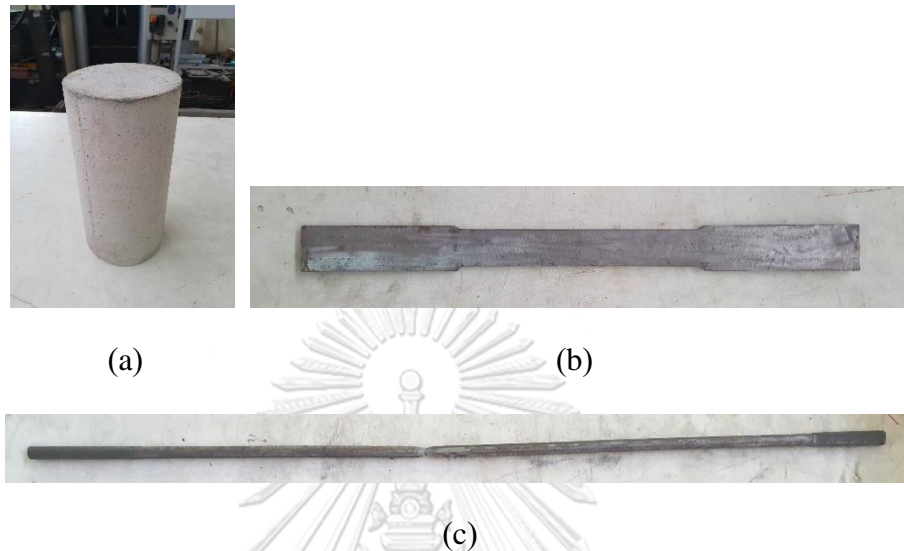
Material property testing; (a) concrete; (b) steel plate; and (c) reinforcement bar.
